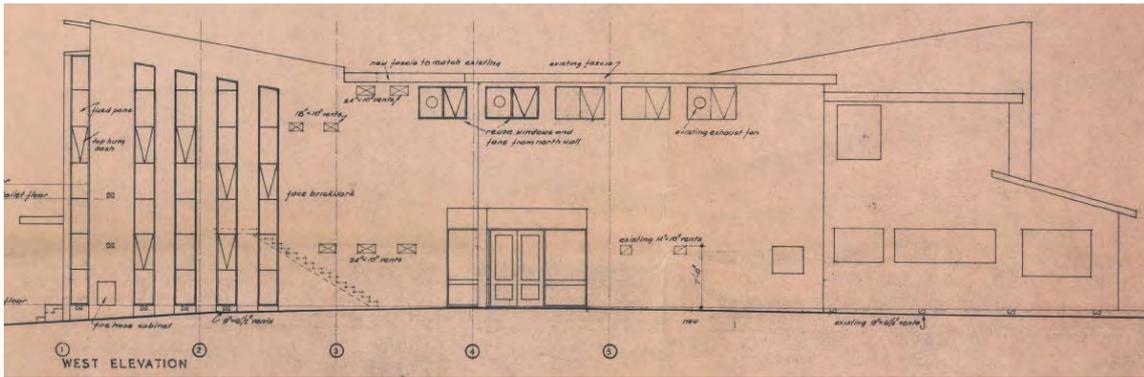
Drawing related to building permit 4609. Proposed west elevation (K Popper, Nov. 1972) (Source: Council Building File)
